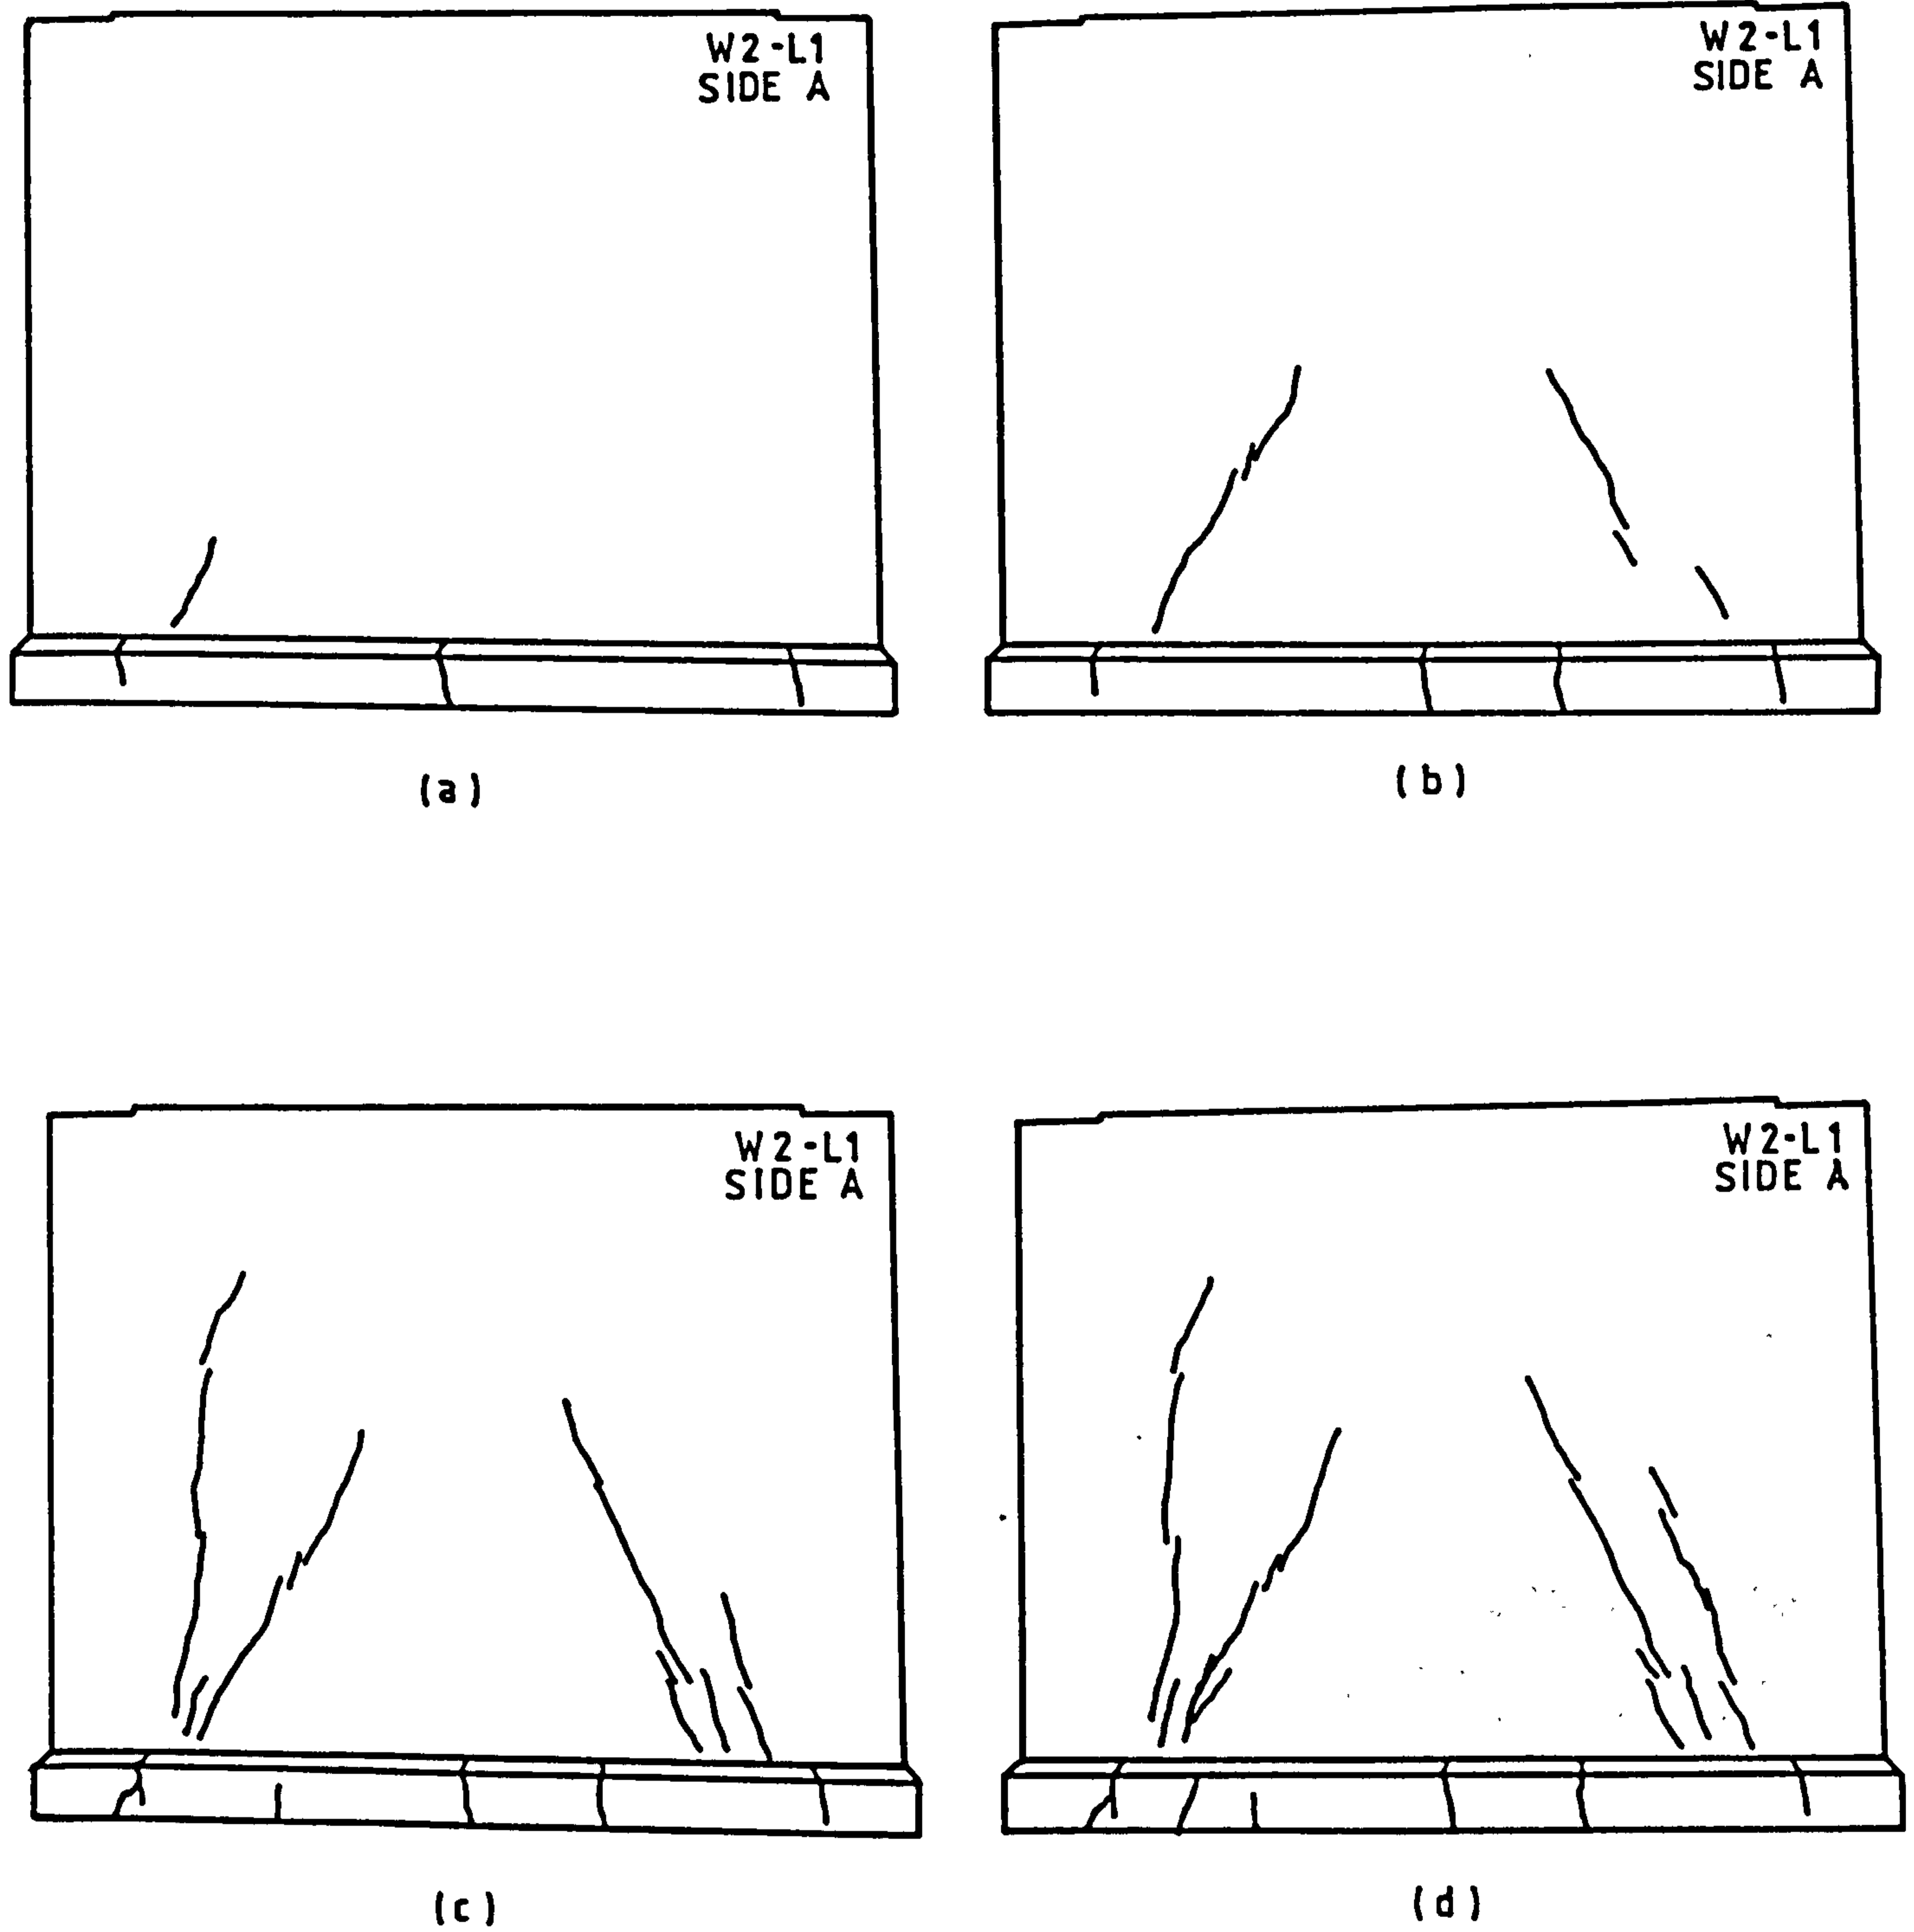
Development of cracks in Wall W2-L1
